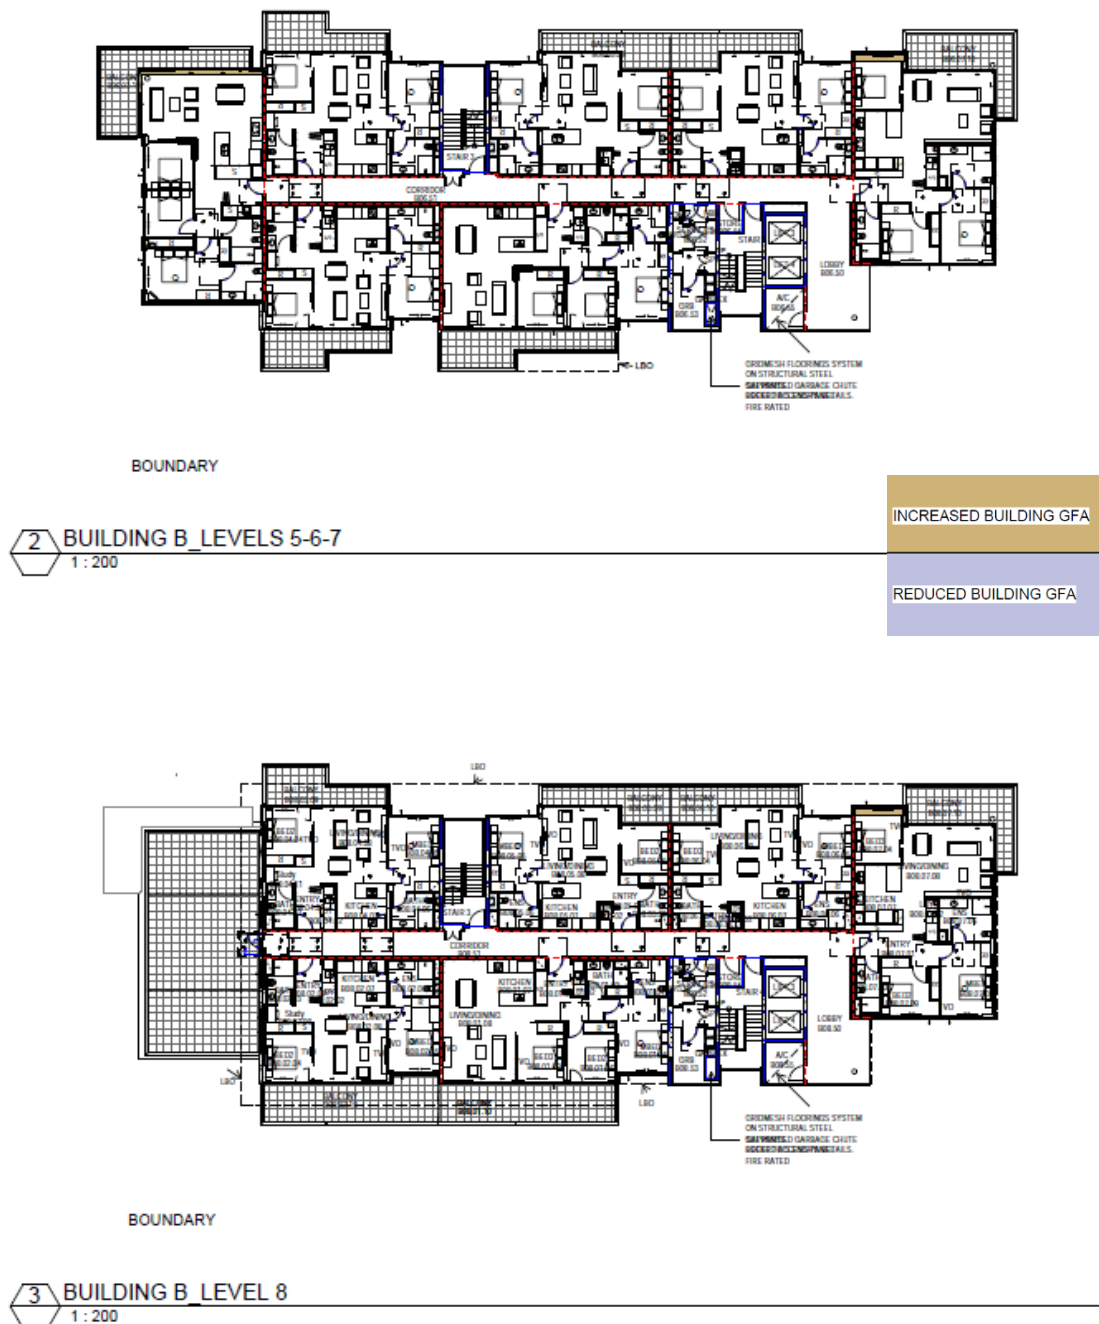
GFA comparison plan (Building B) (Source: PTW Architects)
